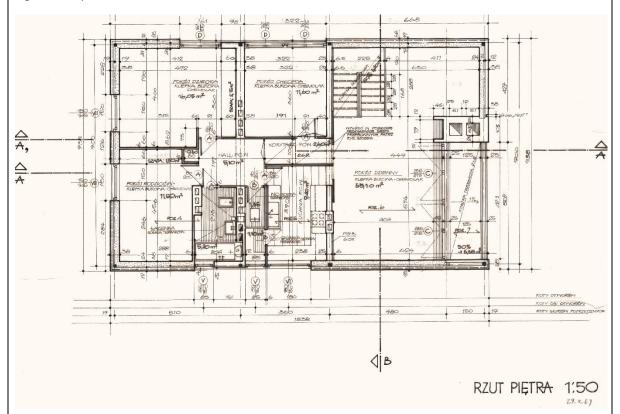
Floor plan of the top level of the house, J. Jarecki, 1969.
